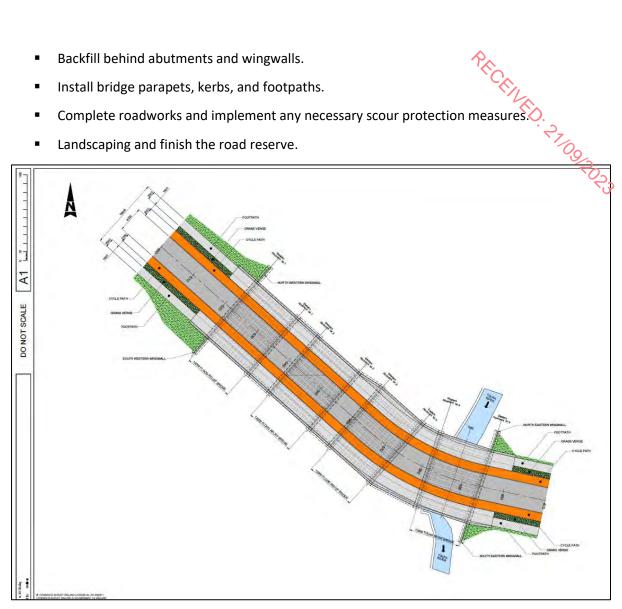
Image adapted from Atkins Drwg No: 205505-ATK-ZZ-ZZ-SK-CE-001701, showing overall bridge layout across floodplain.
